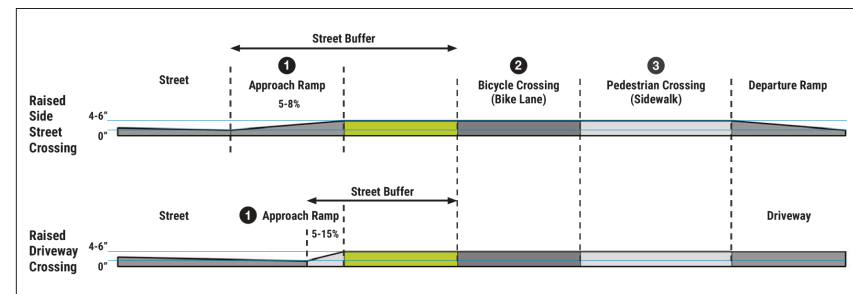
ELEVATION PROFILE FOR RAISED CROSSINGS
